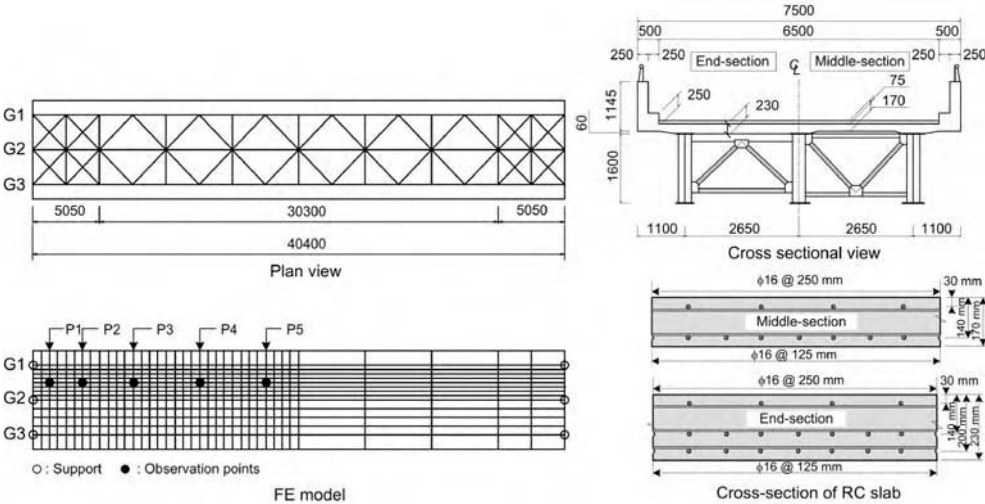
Simply supported steel plate girder bridge with RC deck (unit: mm).
